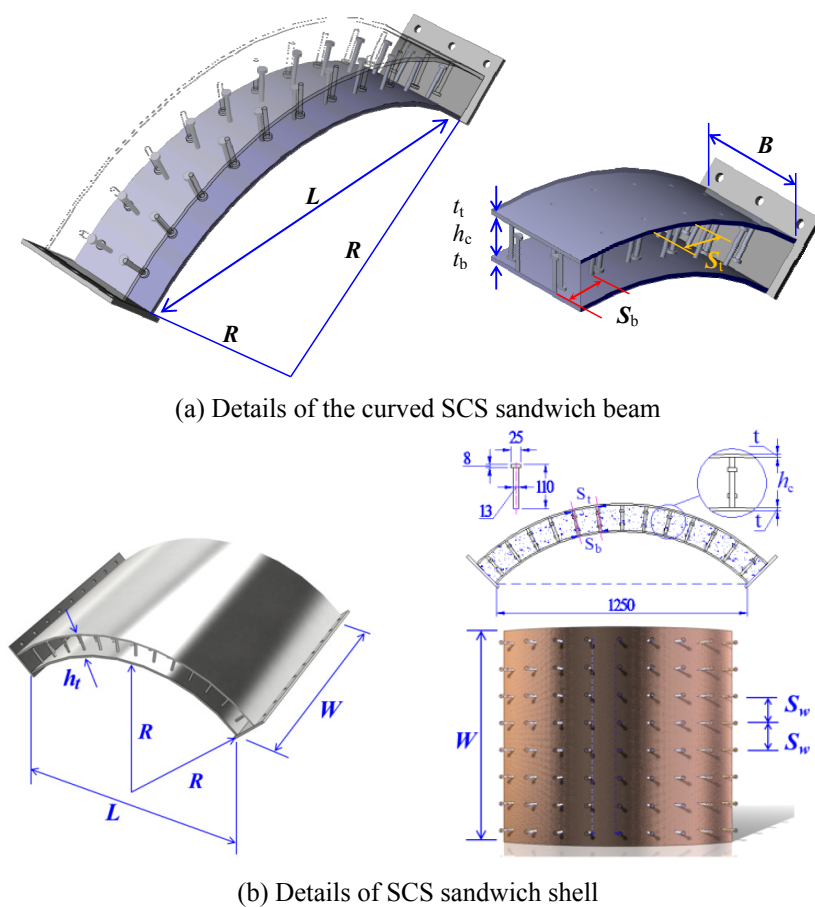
Details of the curved SCS sandwich beam and shell structure
